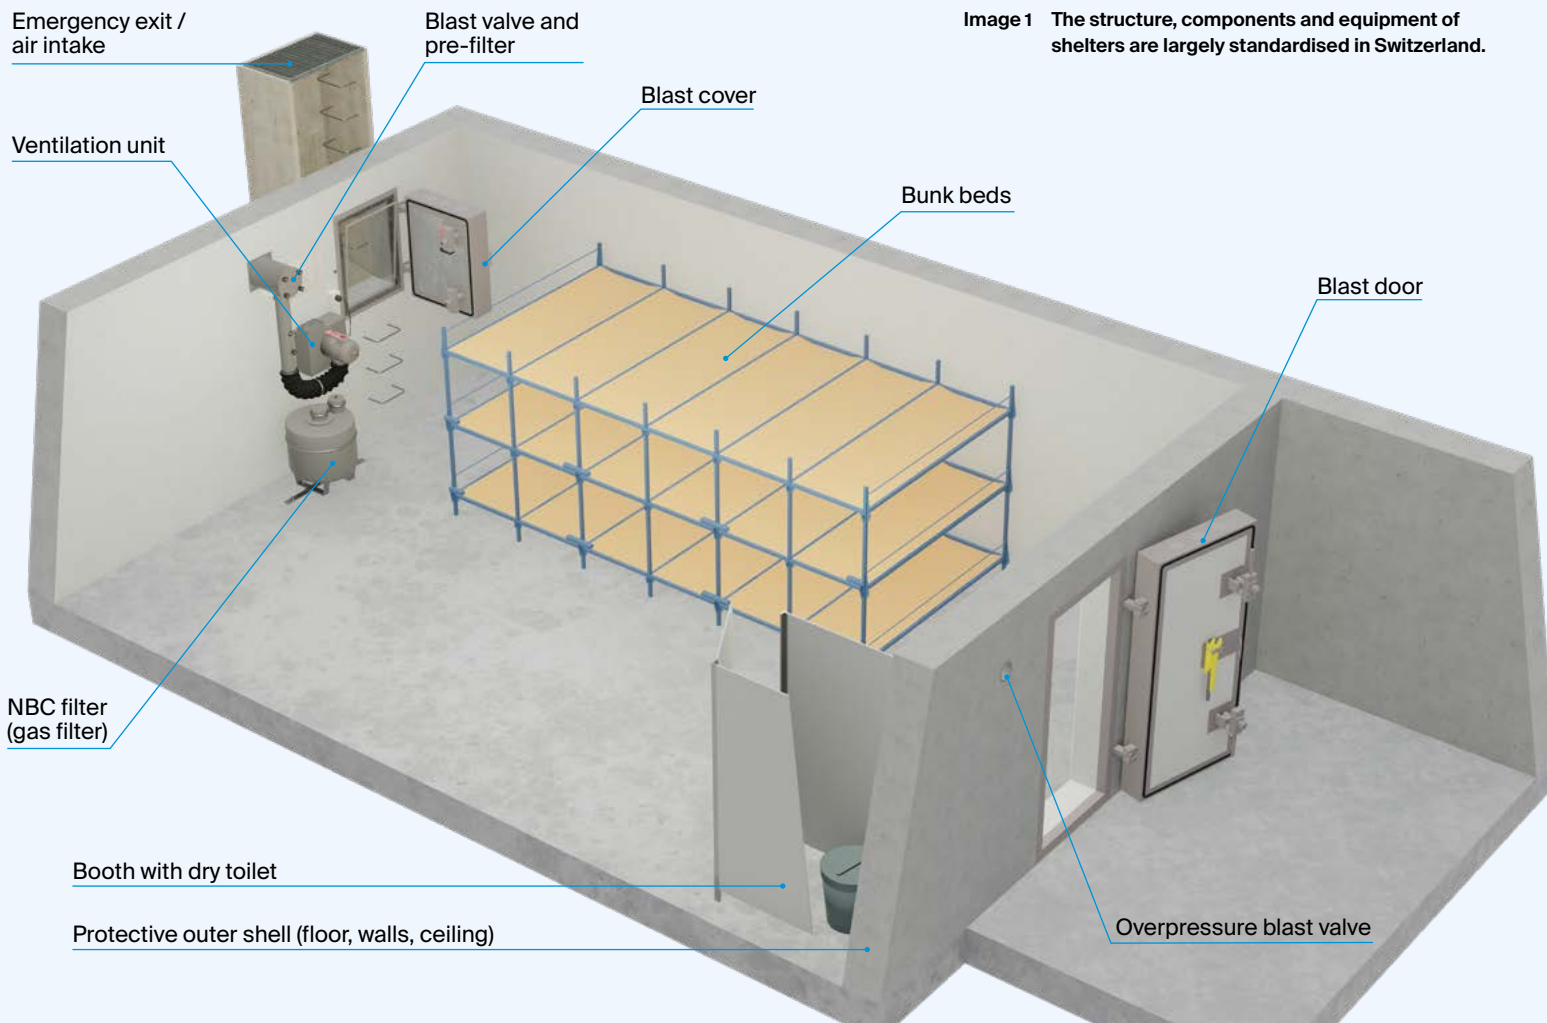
The structure, components and equipment of shelters are largely standardised in Switzerland.
